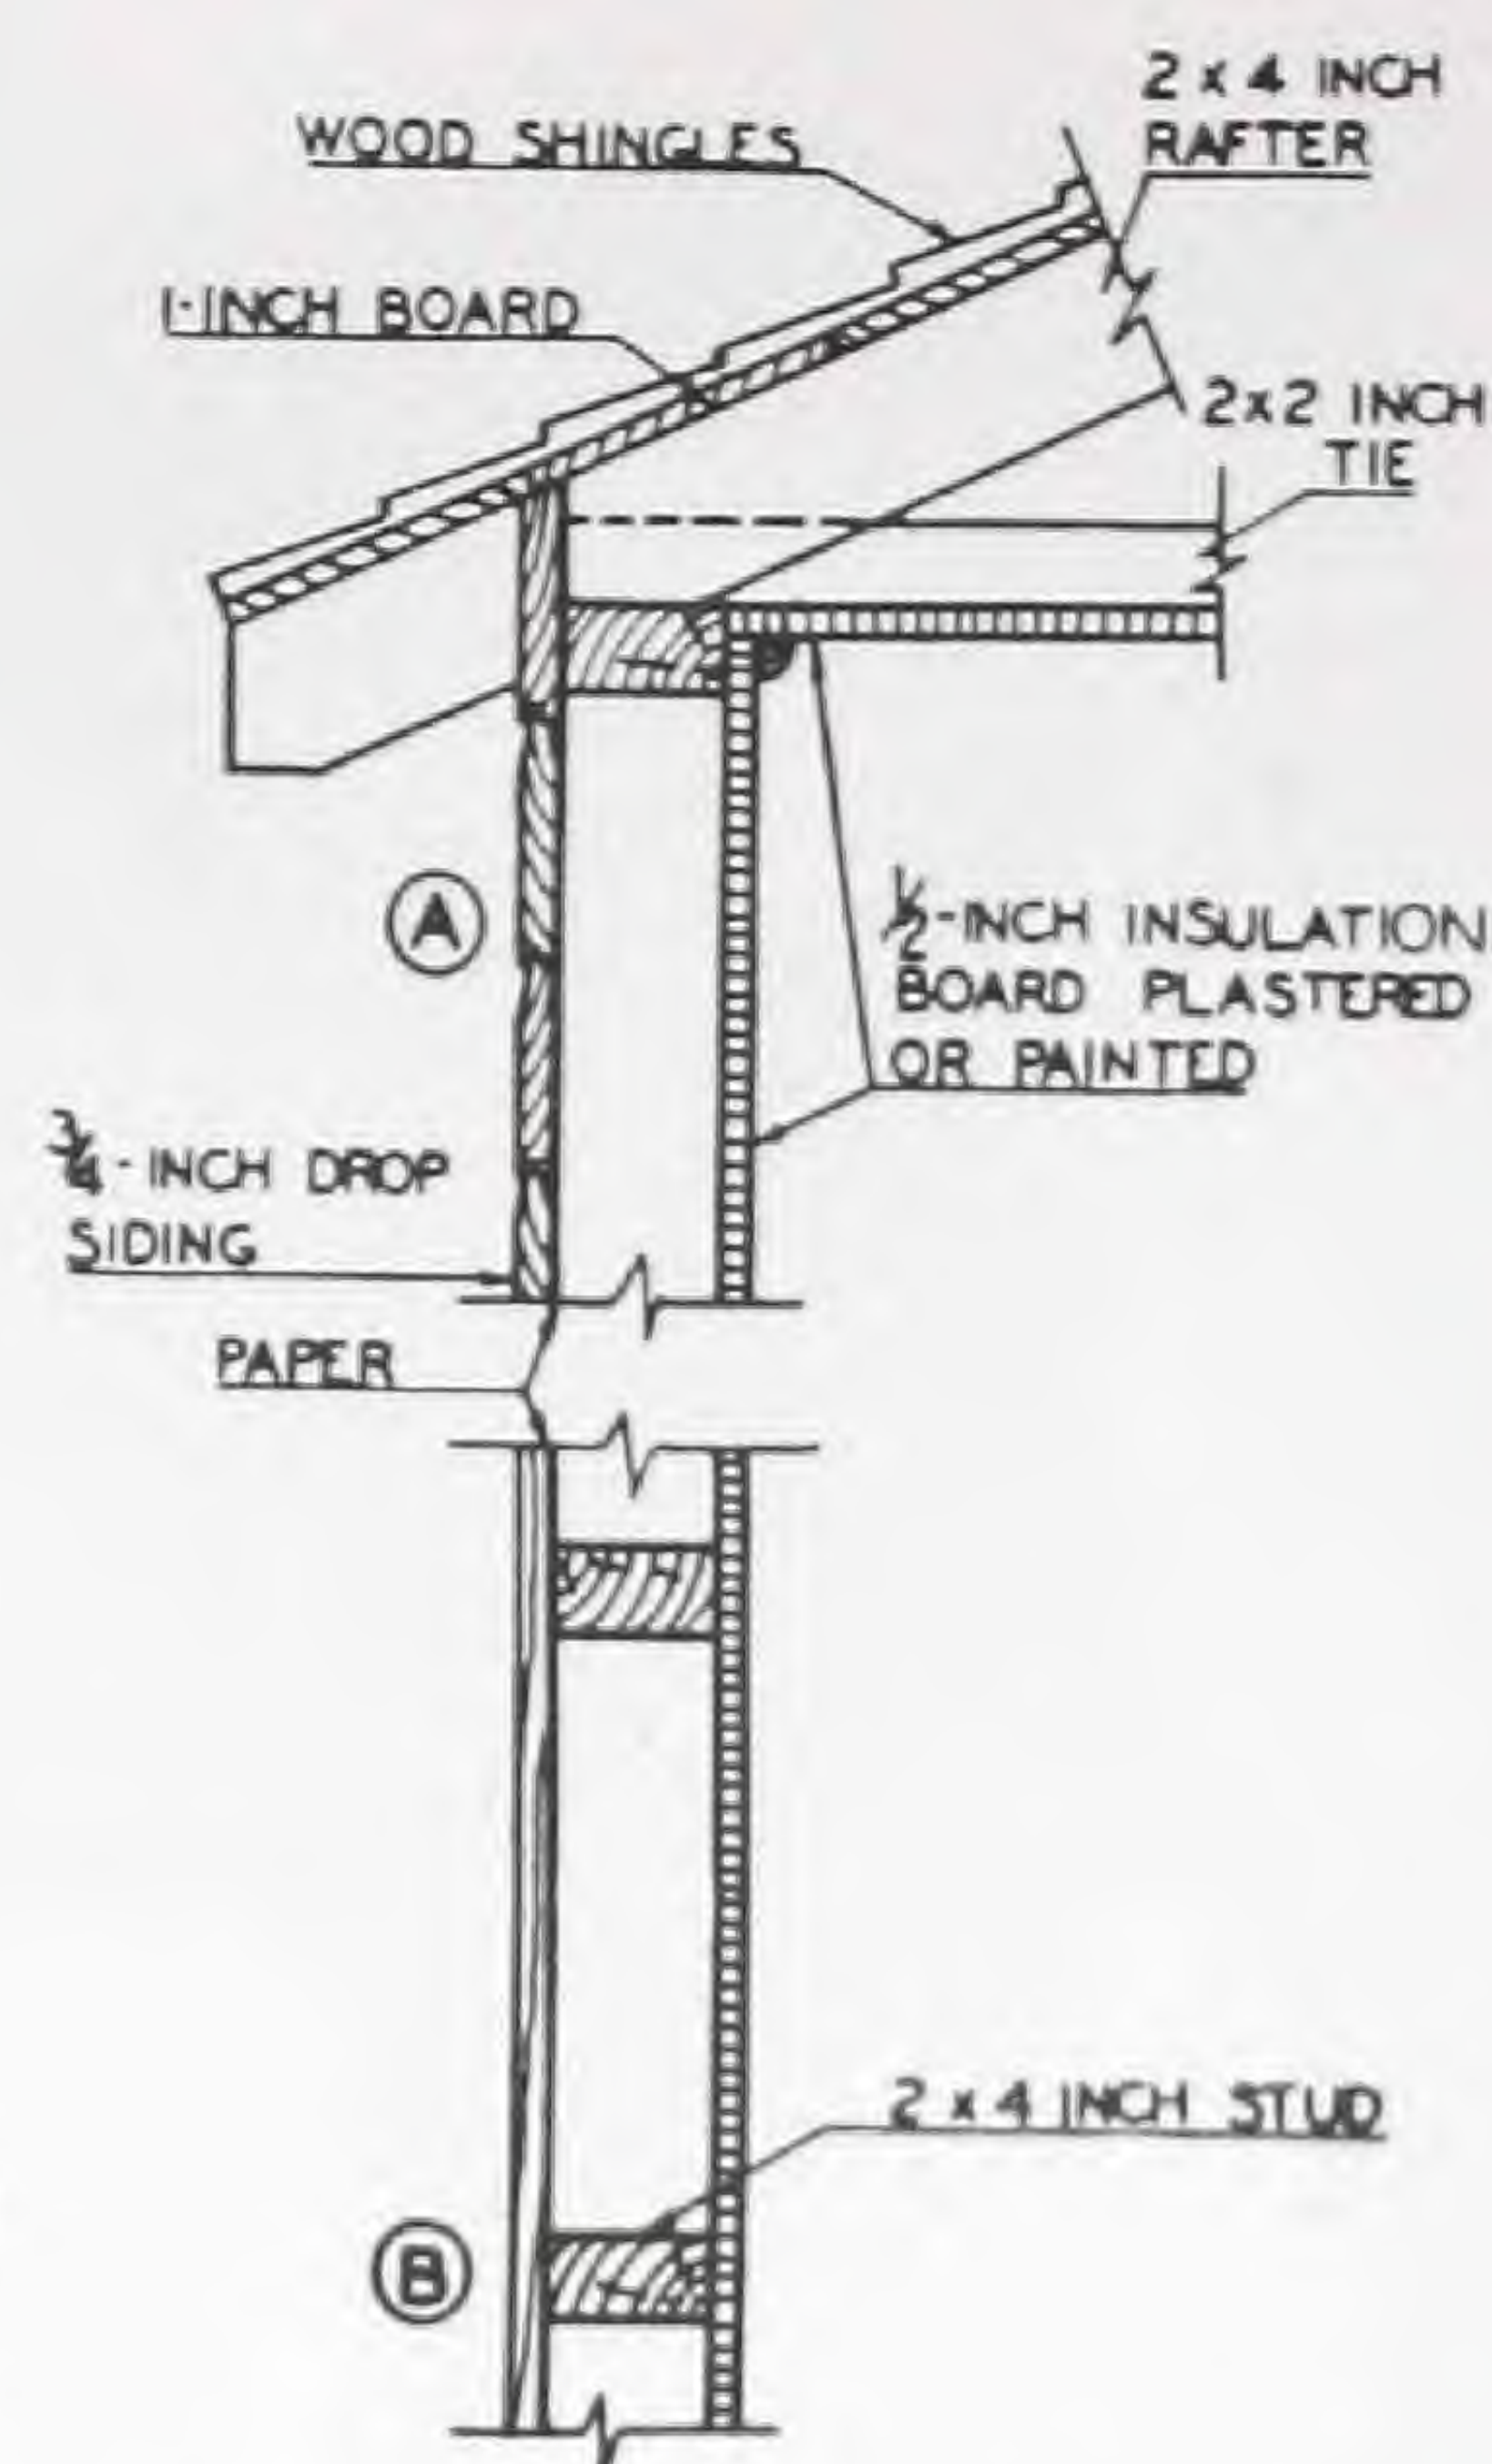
Insulated milk house construction. A is a vertical section through wall, roof and ceiling; B is a horizontal section through wall.
